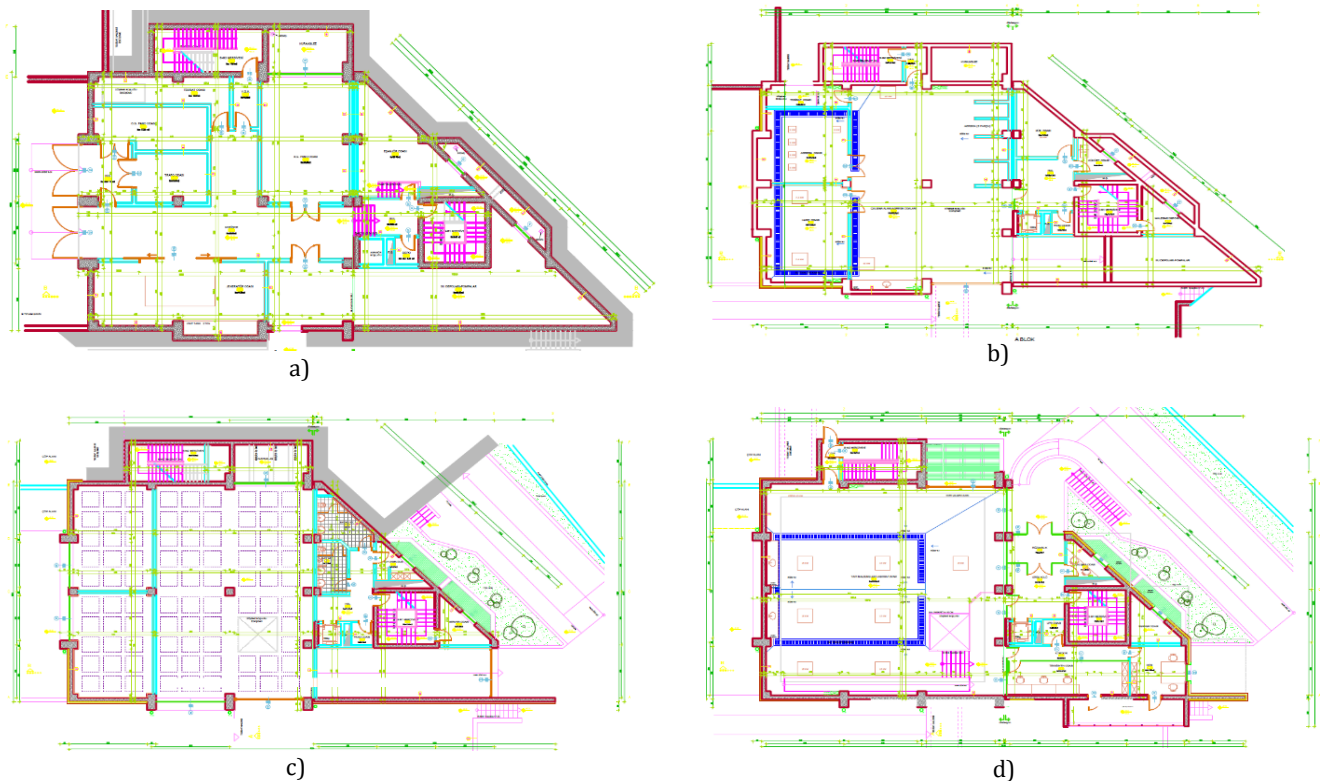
View of the Laboratory Building projects: a) First floor; b) Second floor; c) Third floor; d) Fourth floor.
